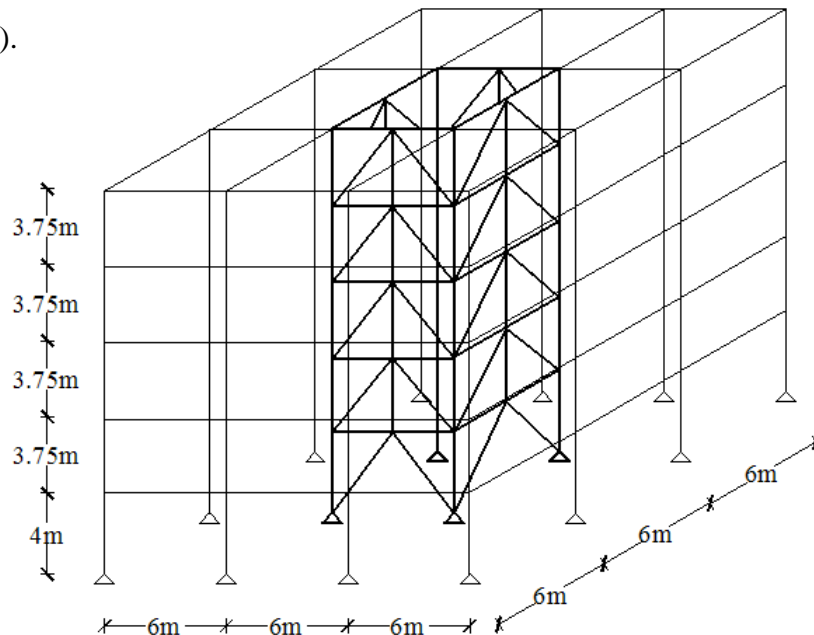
Symmetrical Plan and Section core zipper bracing.
